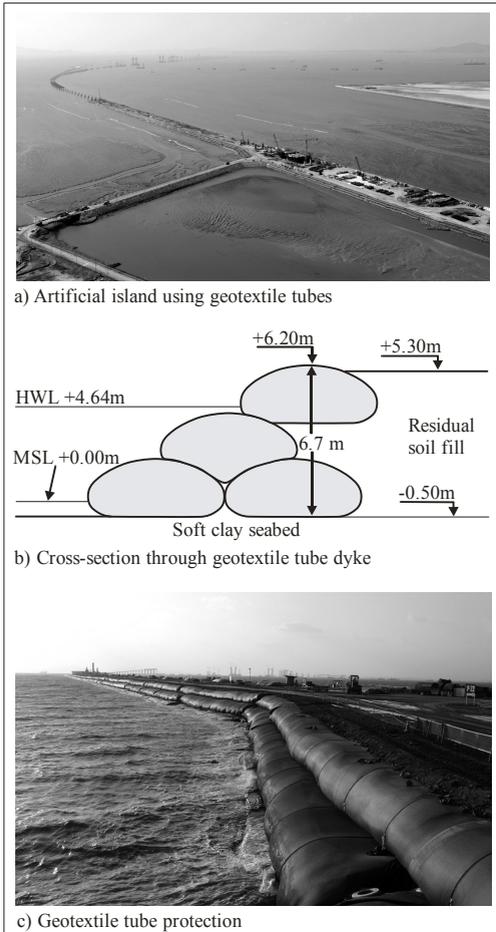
Use of geotextile tubes to construct artificial island, Incheon, Korea (Lawson, 2008)
